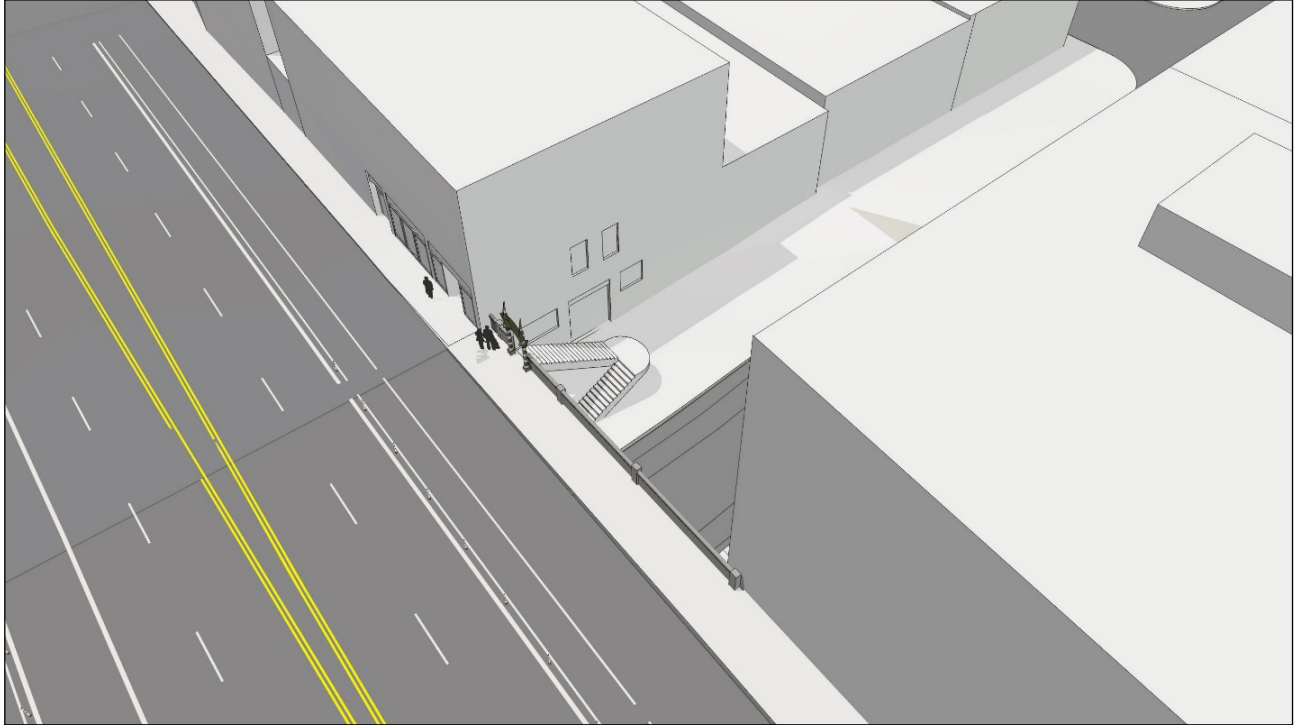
Existing pedestrian access at north side of west approach, artist's rendering, aerial view looking northwest (Fat Pencil Studio, 2021).
